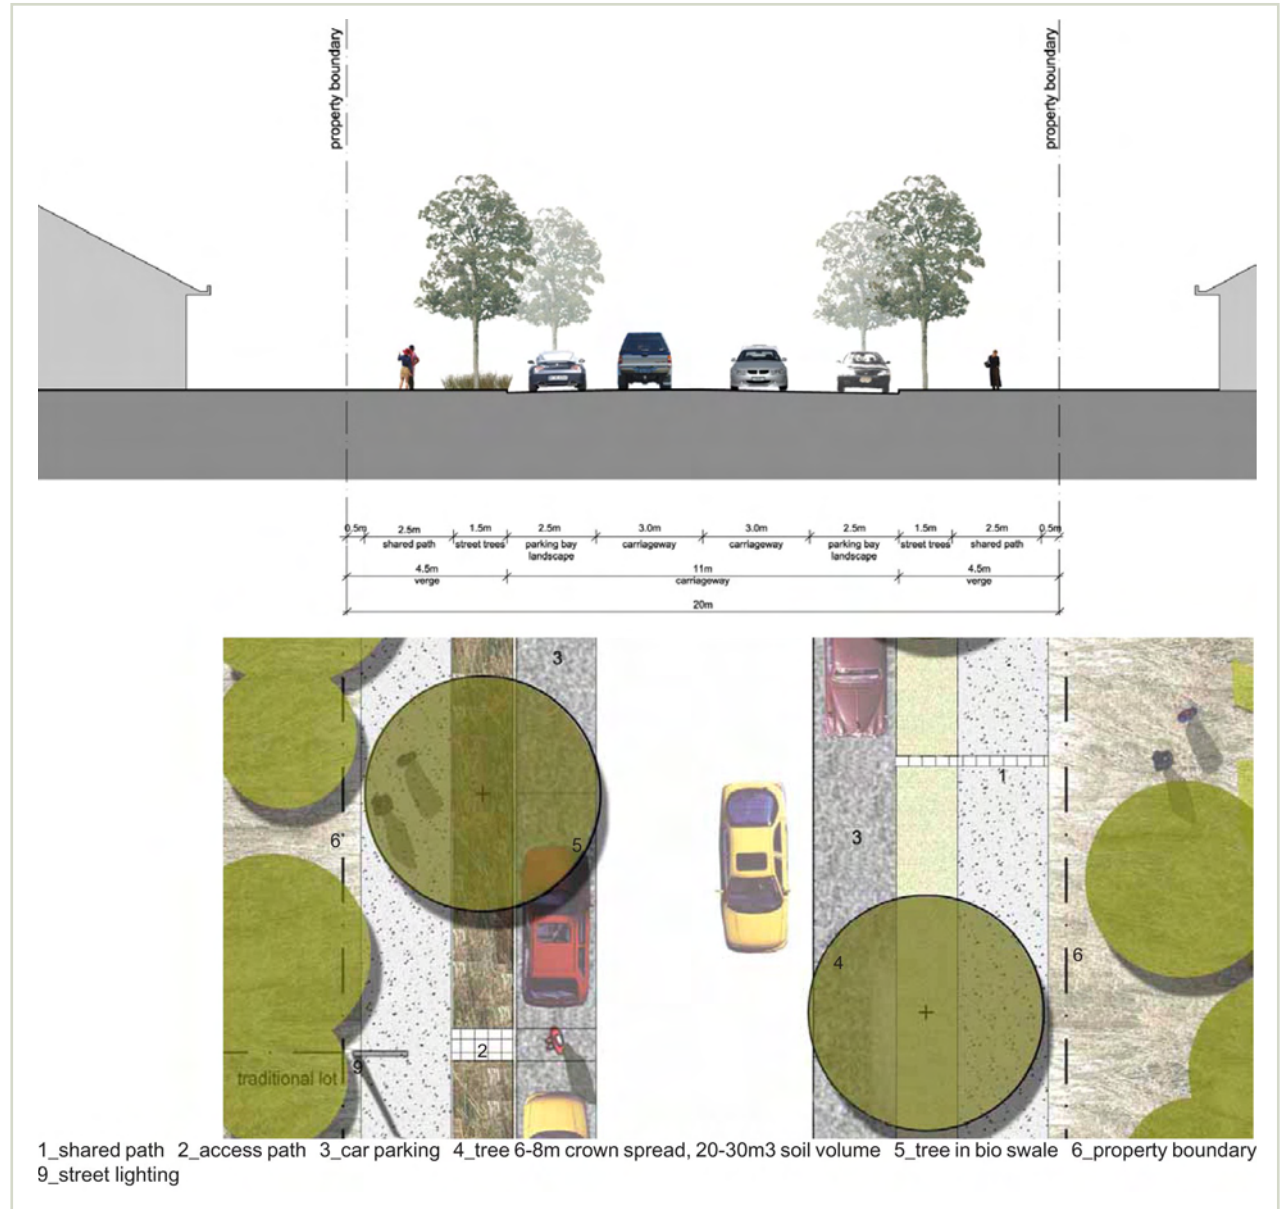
Collector Road B - 20m (Section 4-4)
